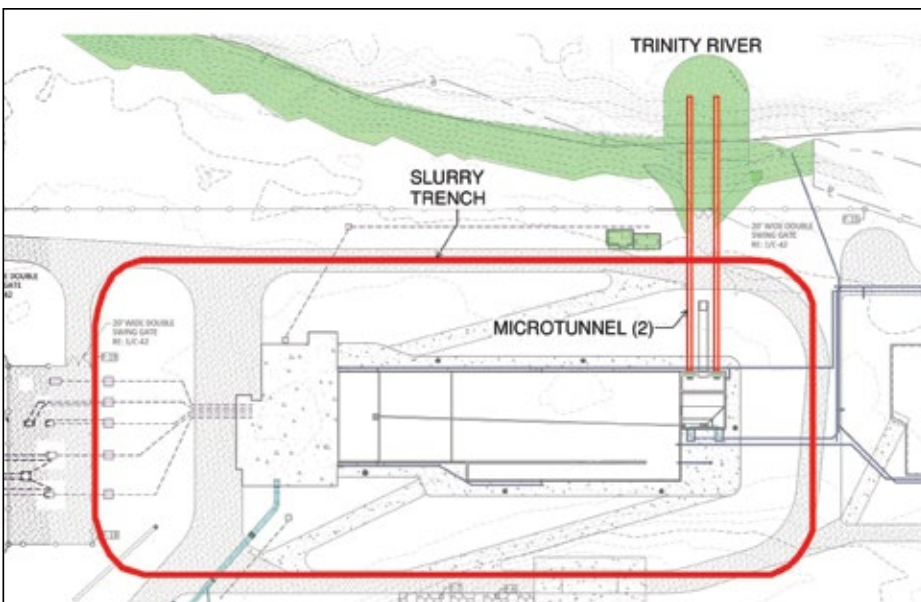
Circular bentonite slurry wall was installed to minimize groundwater interference
